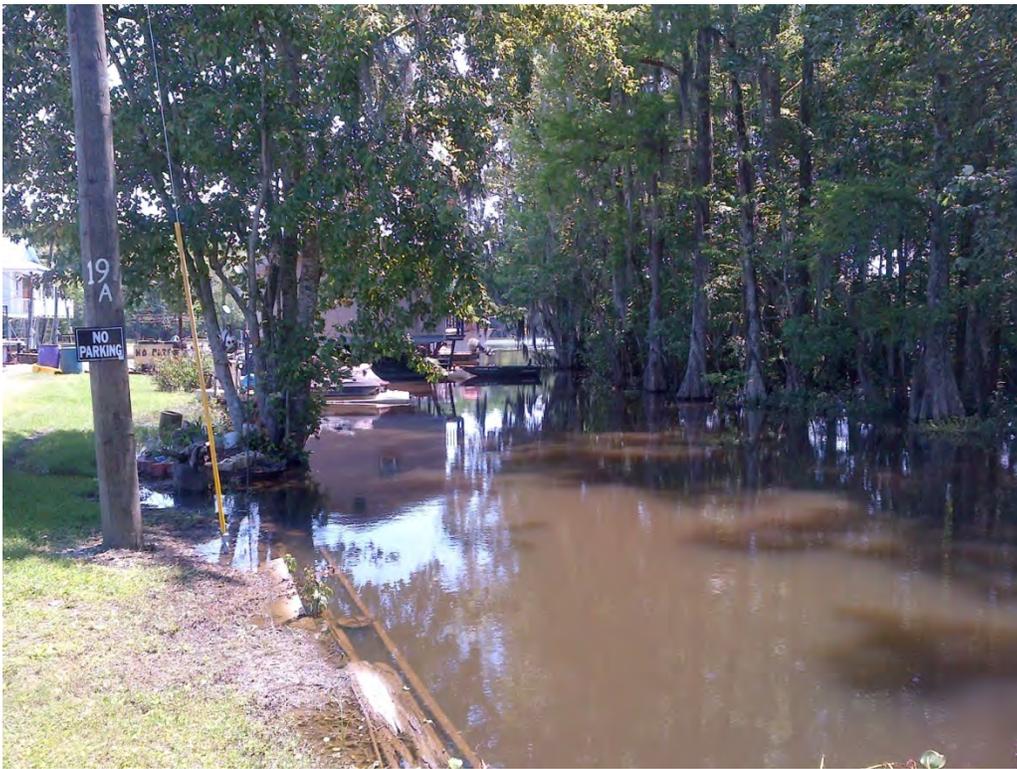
Proposed site location of new pump station with a 48" force main and discharge pipe. Latitude 29.769372, Longitude --91.1681777
